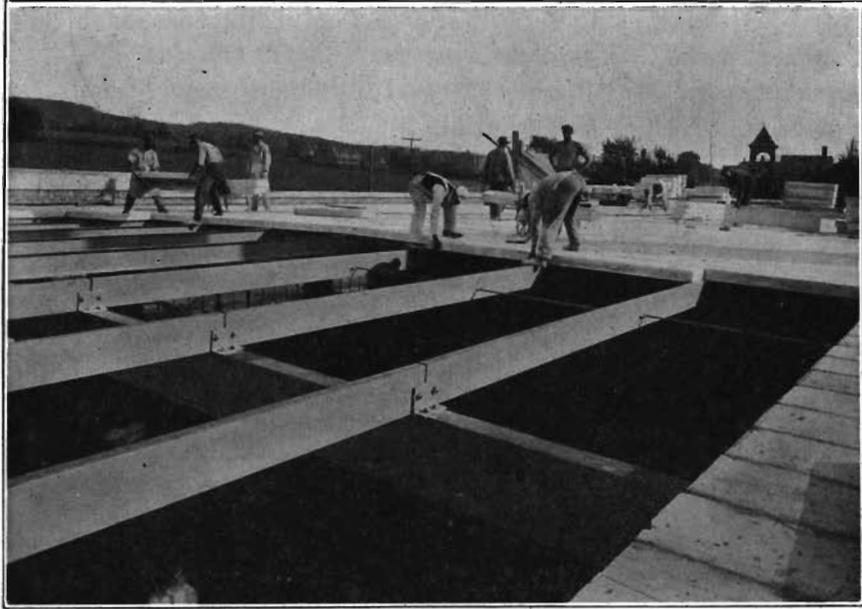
Laying precast gypsum roof tile on purlins. Courtesy United States Gypsum Co.
